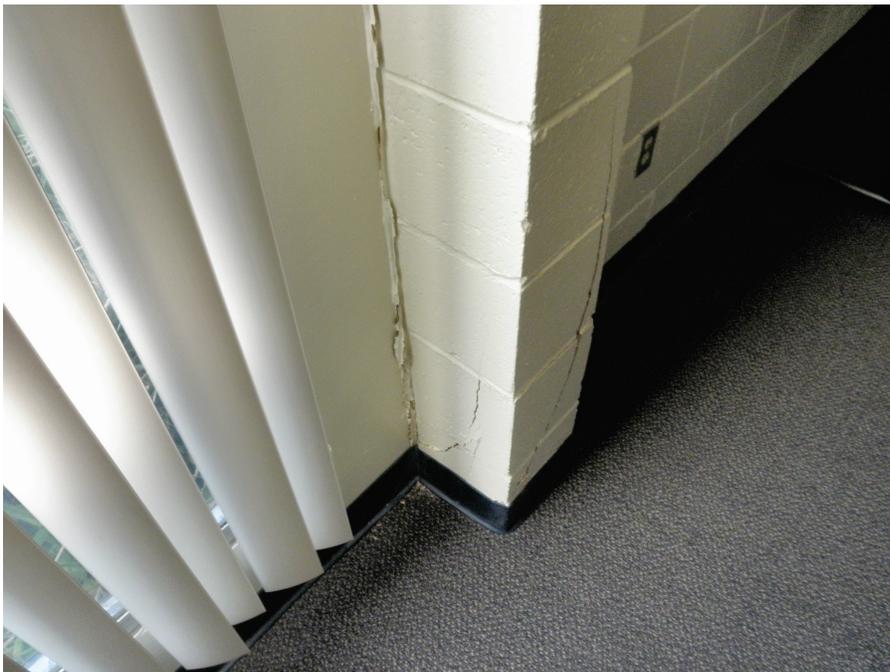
CMU damage at precast concrete panels containing the window.
